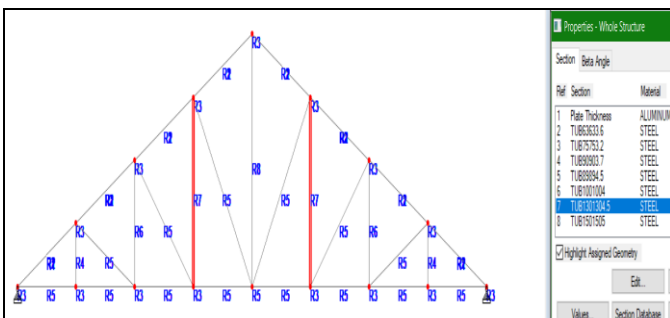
Property of Steel TUB 130 X 130 X 4.5 mm provided for above red colored Member of Steel Truss.
